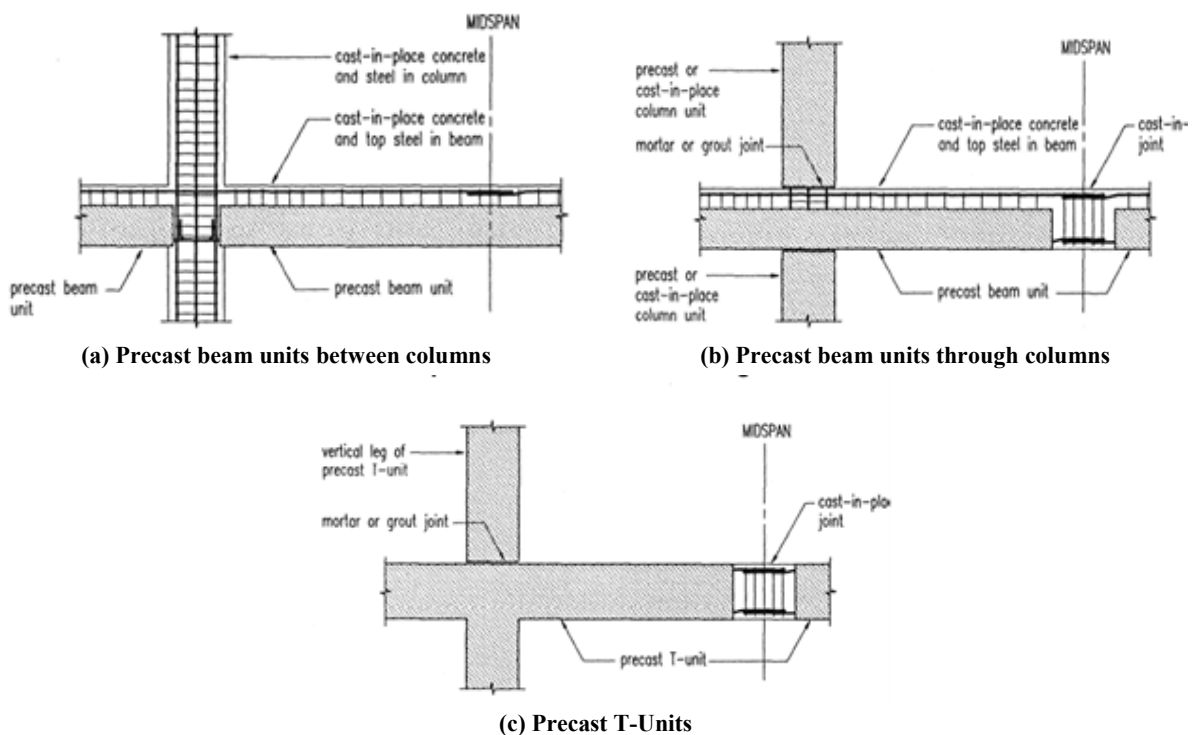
Arrangement of precast elements and insitu concrete to achieve a strong connection type (CAE, 1999).
